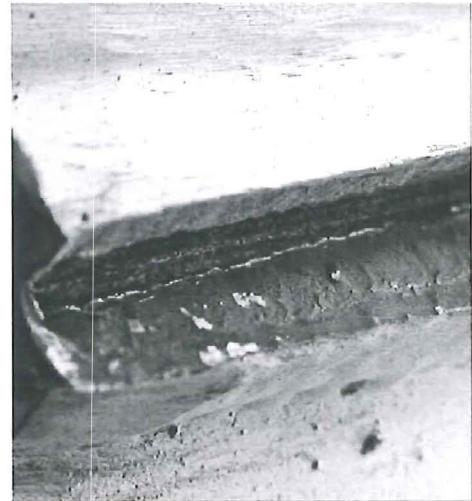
and 29.10: Test specimen after failure. Views of the two parts.
